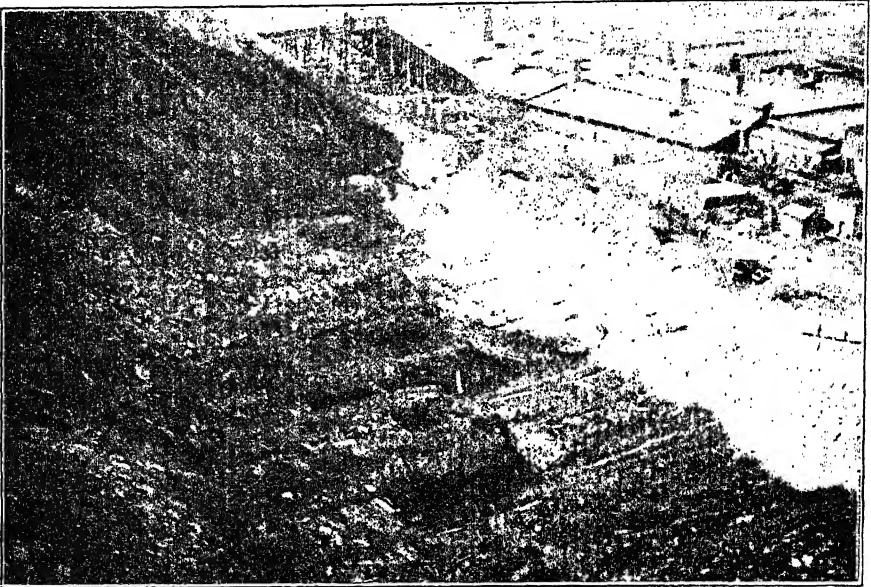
GENERAL LAYOUT OF TRACKS AND TUNNELS.
